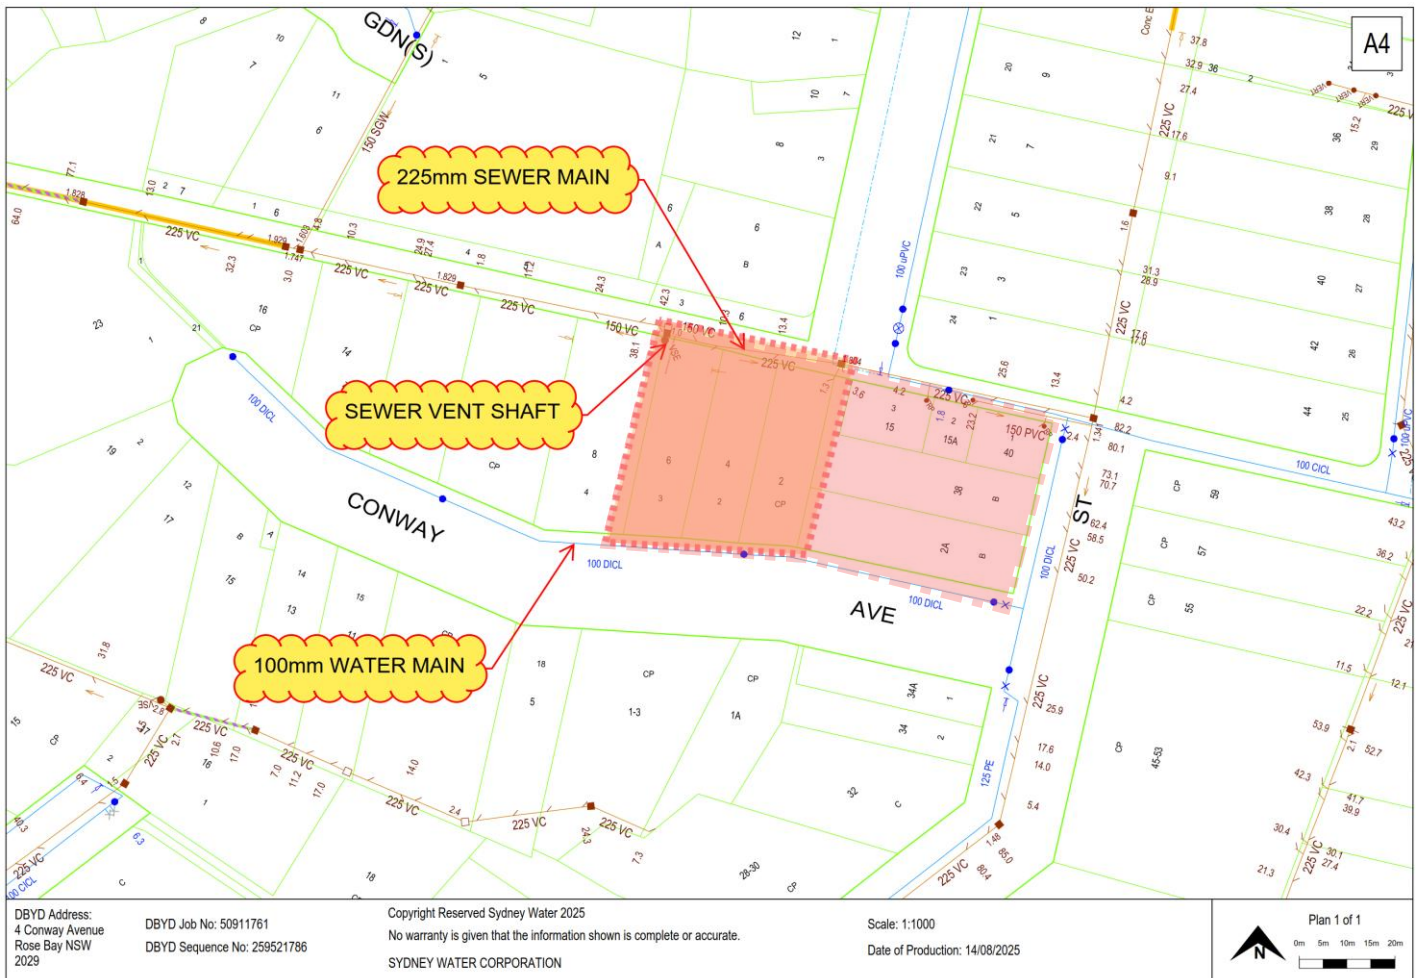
Connection Point to DN225 VC Sewer Water Main on Fernleigh Ave (Source: DBYD)
